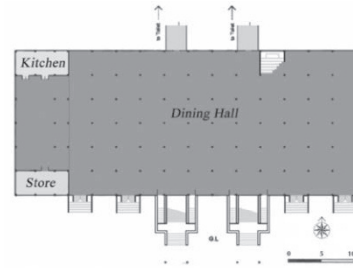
Ground Floor Plan of Bein-Daw Kyaung^{*16}
